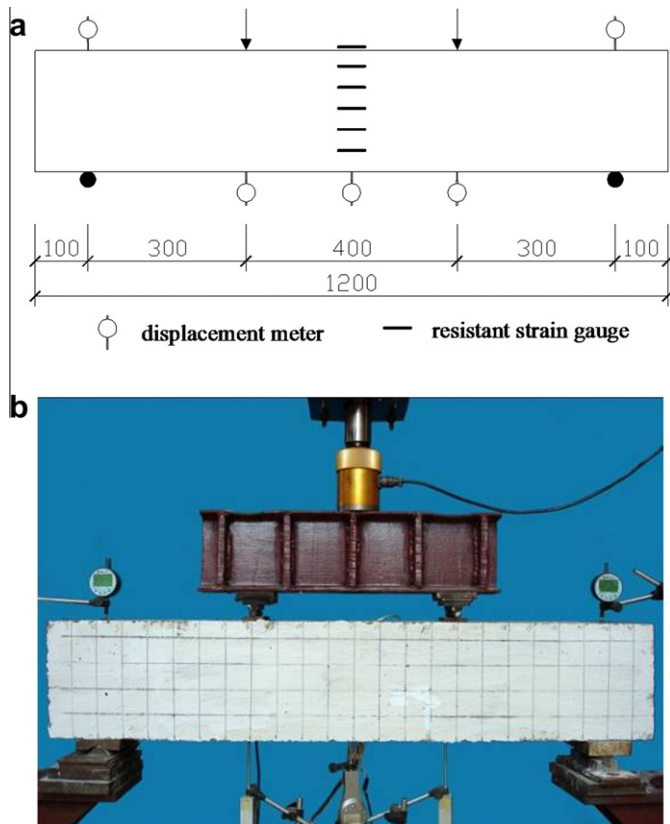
Loading test arrangement (units: mm). (a) Schematic presentation and (b) on-site loading test.
